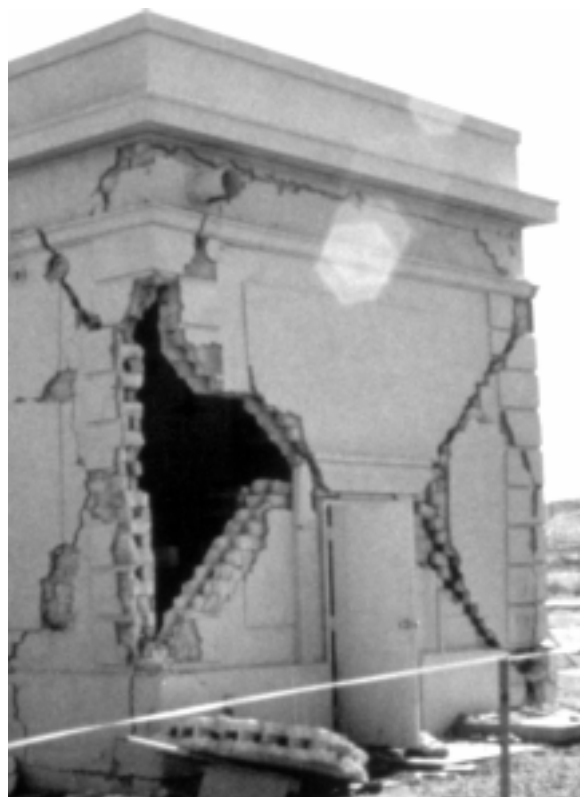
Earthquake-induced shear cracks in unreinforced masonry wall building.
